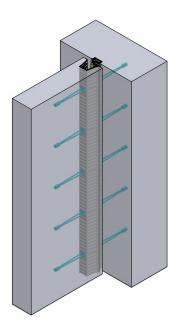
WILORA® 50 in a straight wall-to-wall connection.
